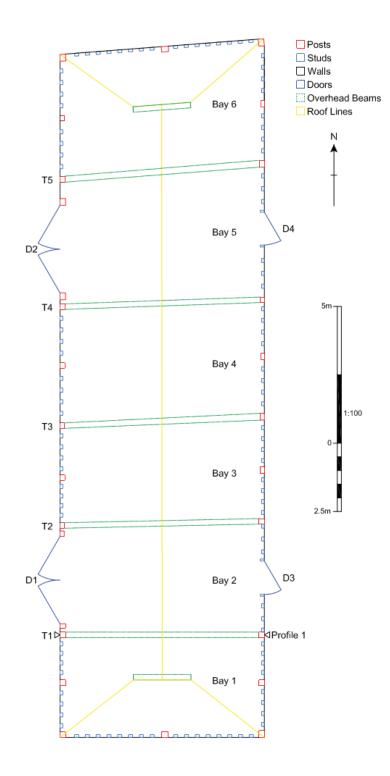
Plan of Norton Hall Barn, showing the location of trusses and bay and door numbering (Moller 2012)
